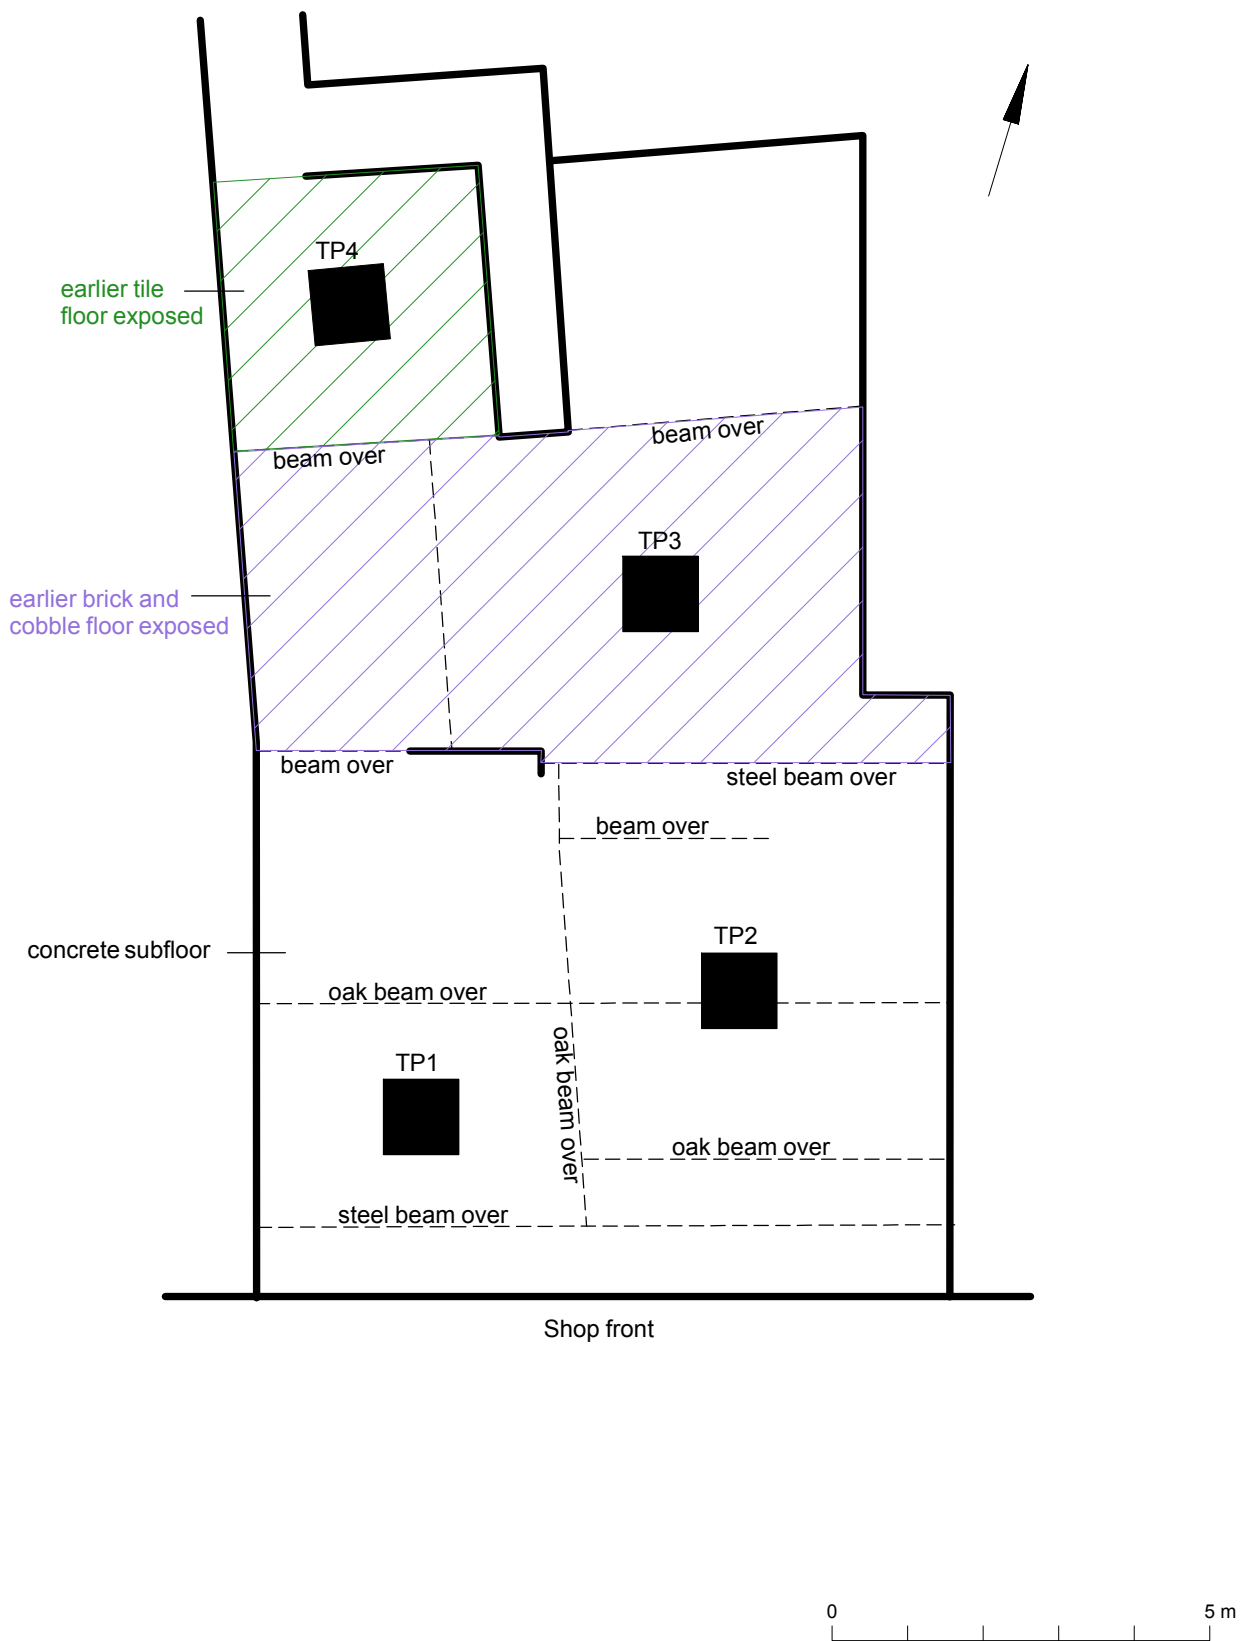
Floor plan of building showing location of proposed test-pits, shown in relation to exposed surviving tile, brick and cobble floors (to be recorded)
